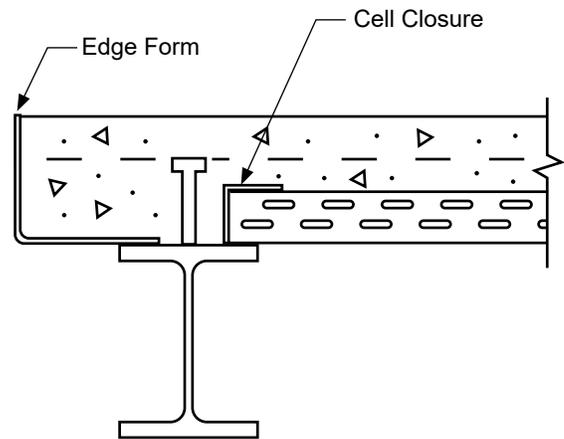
SINGLE PIECE EDGE FORM PERPENDICULAR TO DECK ON WIDE FLANGE BEAM
